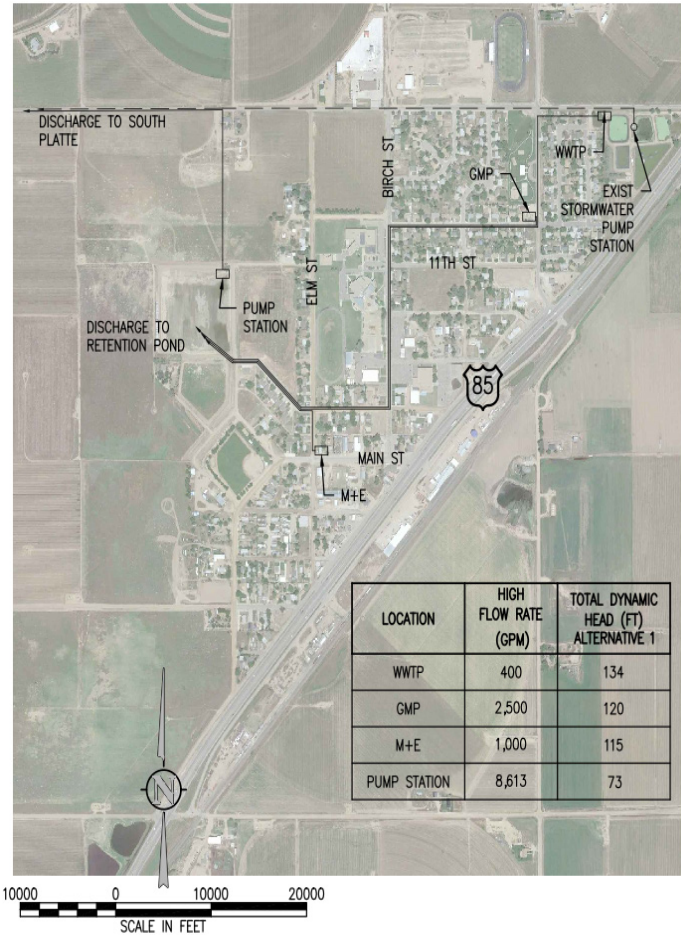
Proposed dewatering wells for the Town of Gilcrest
